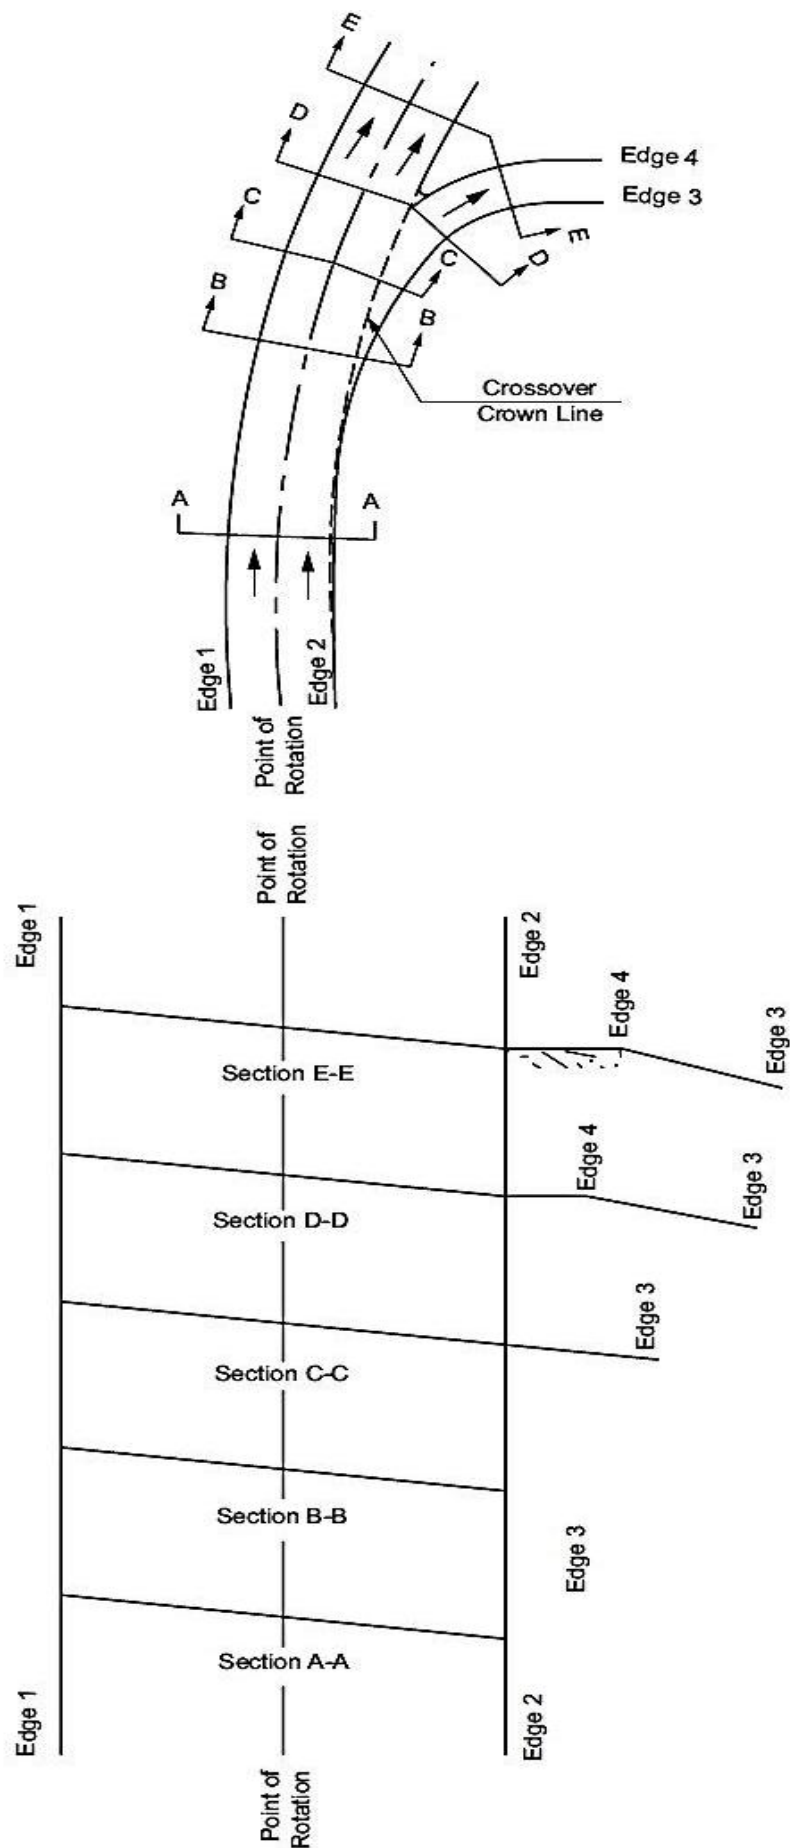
/2: Development of Superelevation at Turning Roadway Terminals [4, p. 649]
